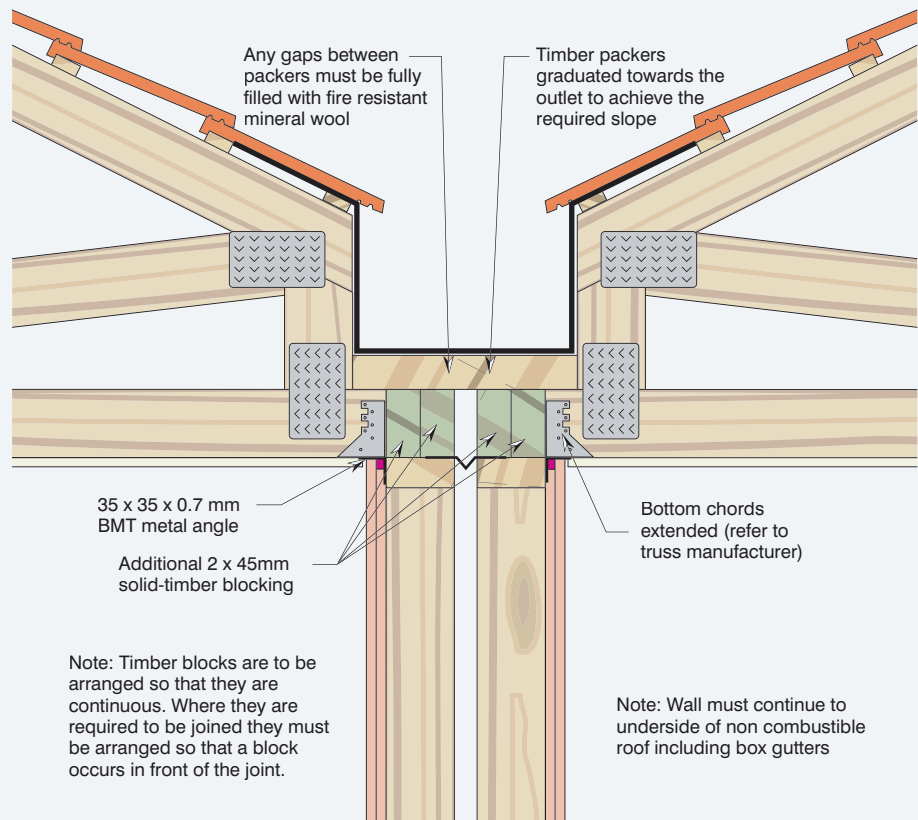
Timber blocks used to maintain fire-resistance – FRL 90 minutes under box gutter – elevation view.
